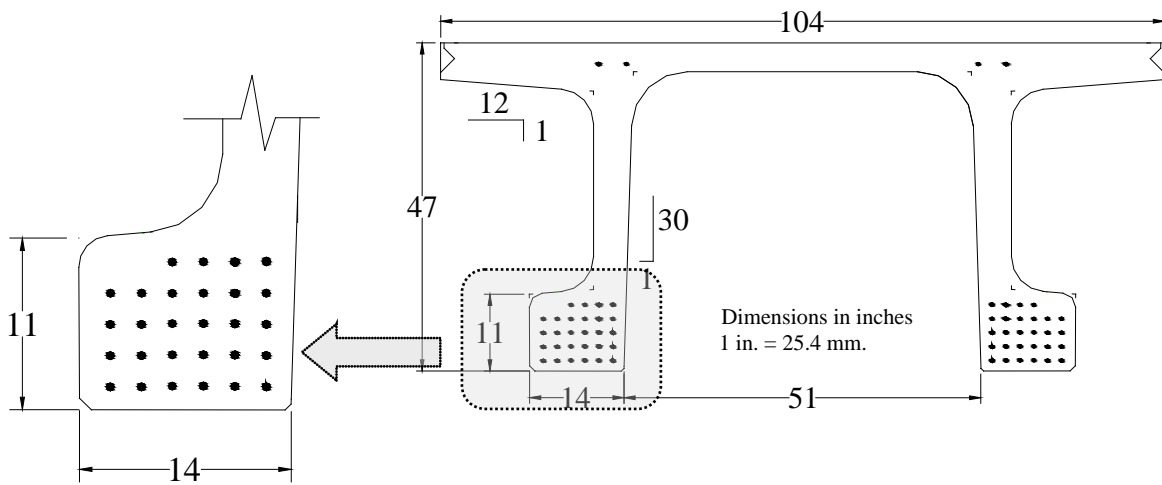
Illustration. Strand Layout of Section IV for 135-foot (41.1-m) Span
